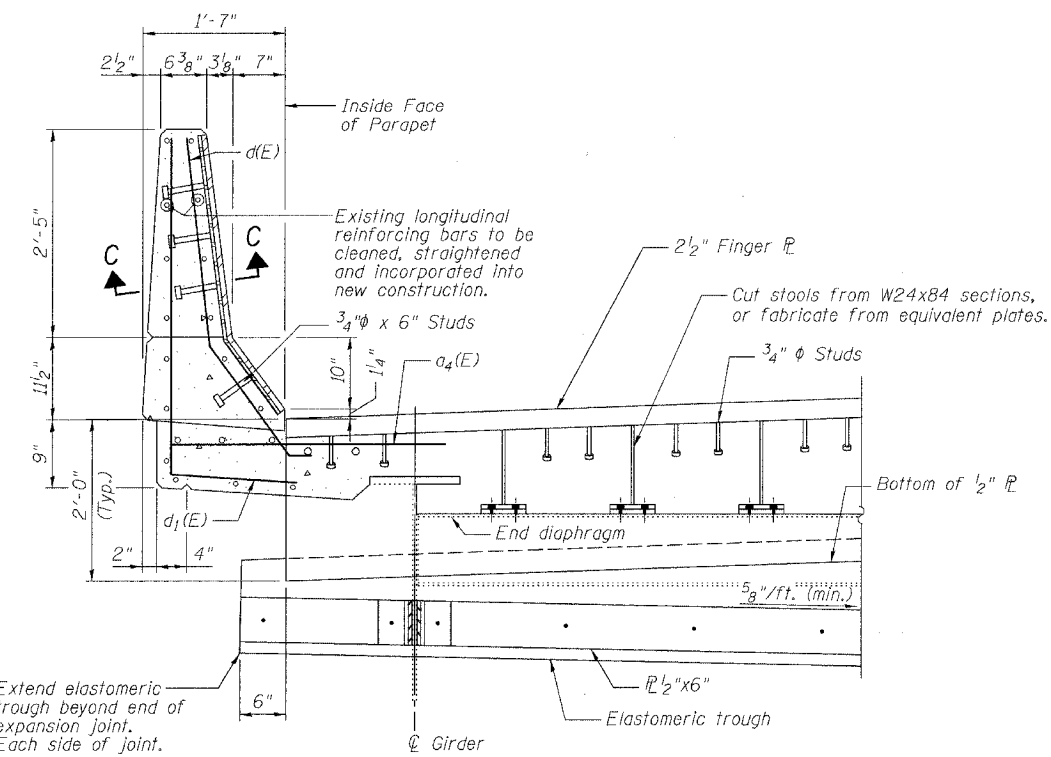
DETAIL AT N.B. FAI 90/94 & RAMP C PARAPET - SPAN 1
